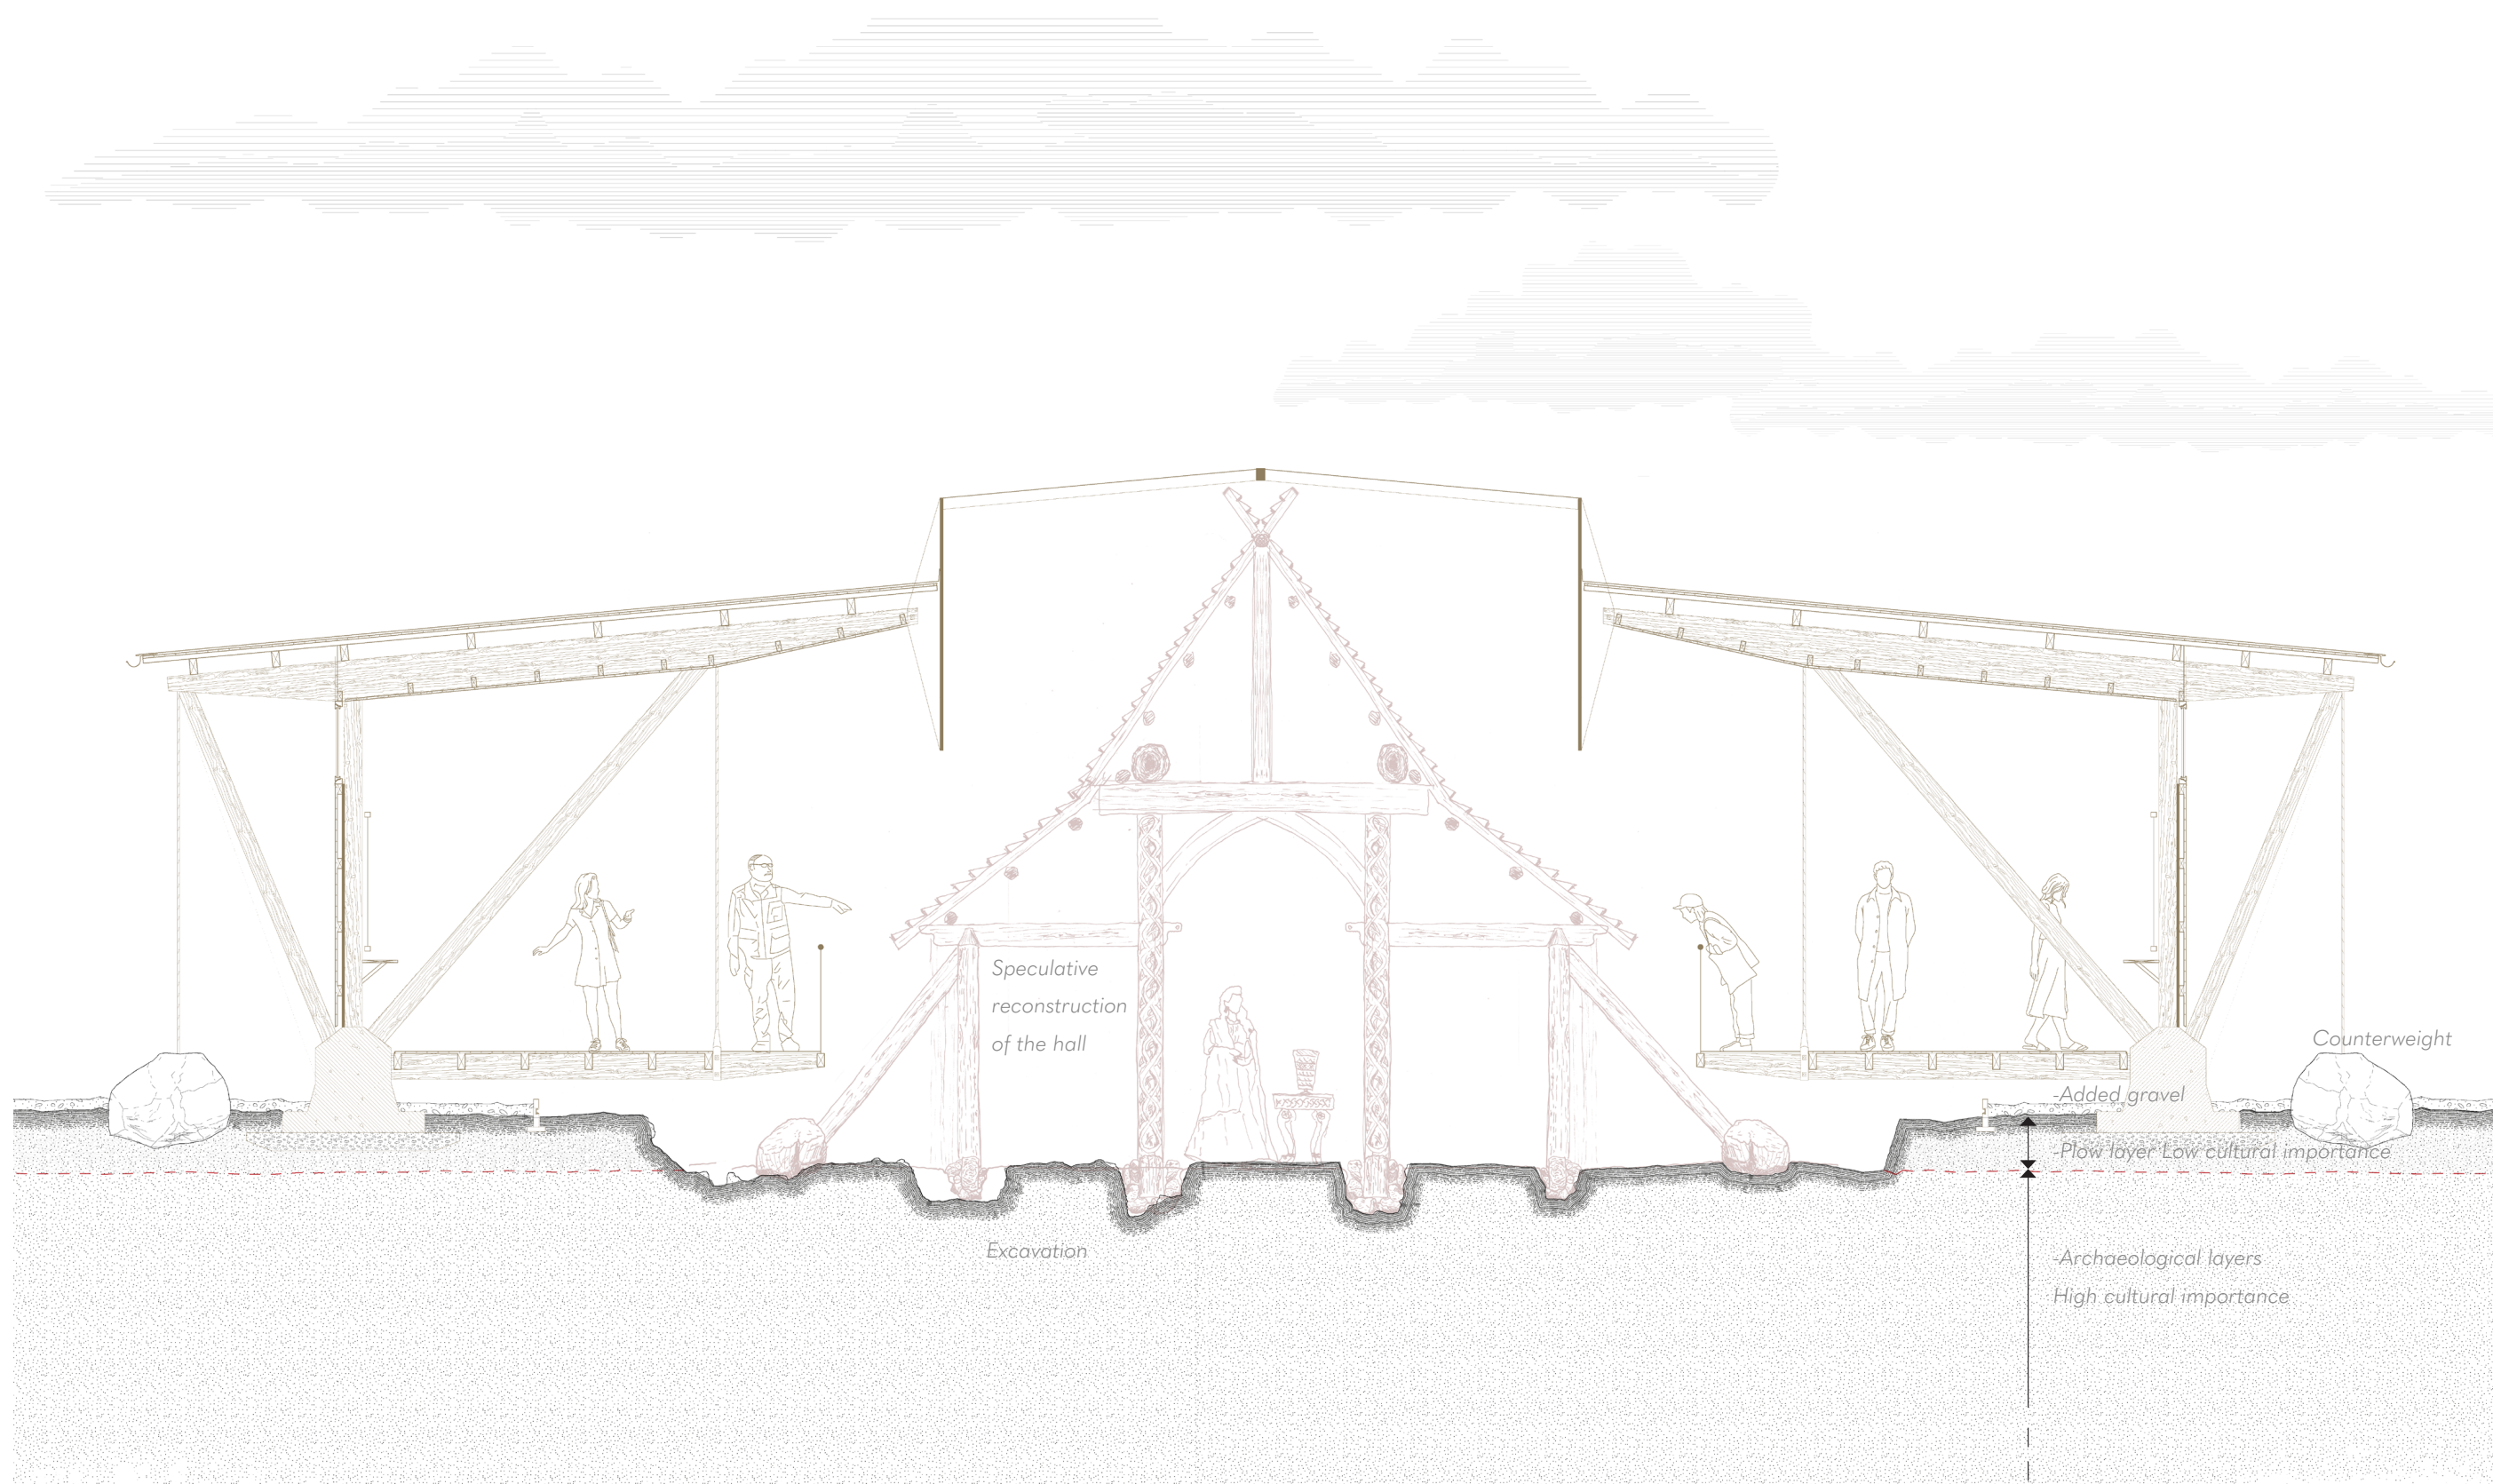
Detail of the excavation, the protective shelter shown in beige and the excavated hall shown in red.
